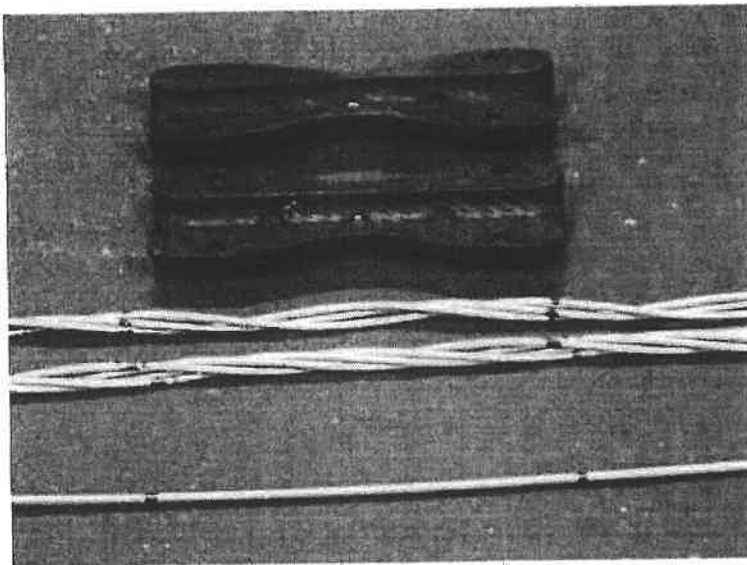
After test, outer wires taken off, view on stainless steel tube (bottom of the picture), no damage.
